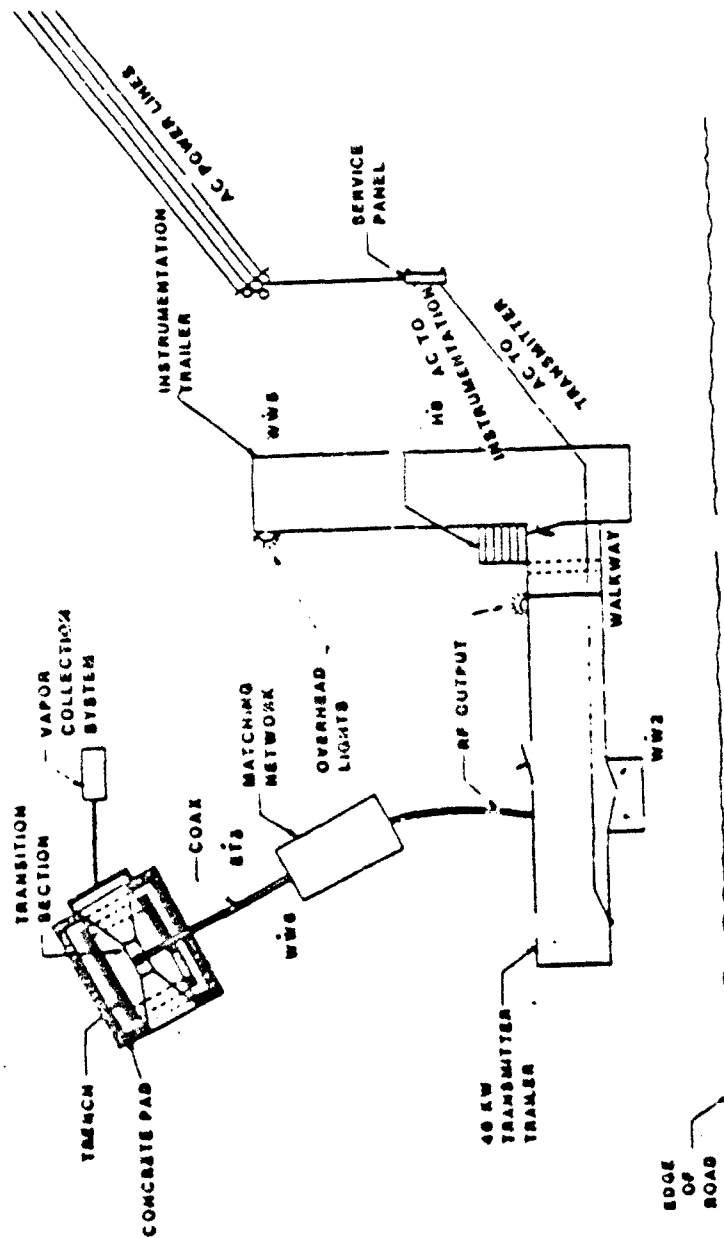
Volk Field ANGB Fire Training Pit Demonstration Site Layout.
